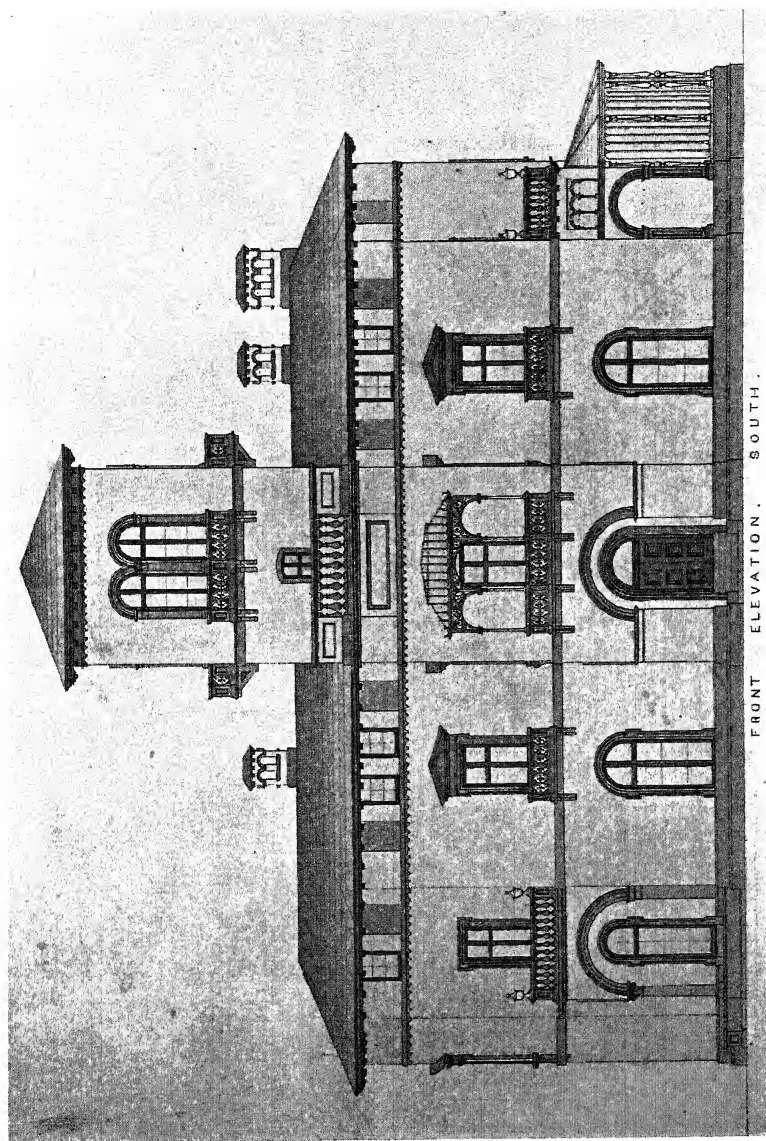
E. B. LITCHFIELD HOUSE, BROOKLYN, 1855. ORIGINAL DRAWING, SOUTH ELEVATION.
